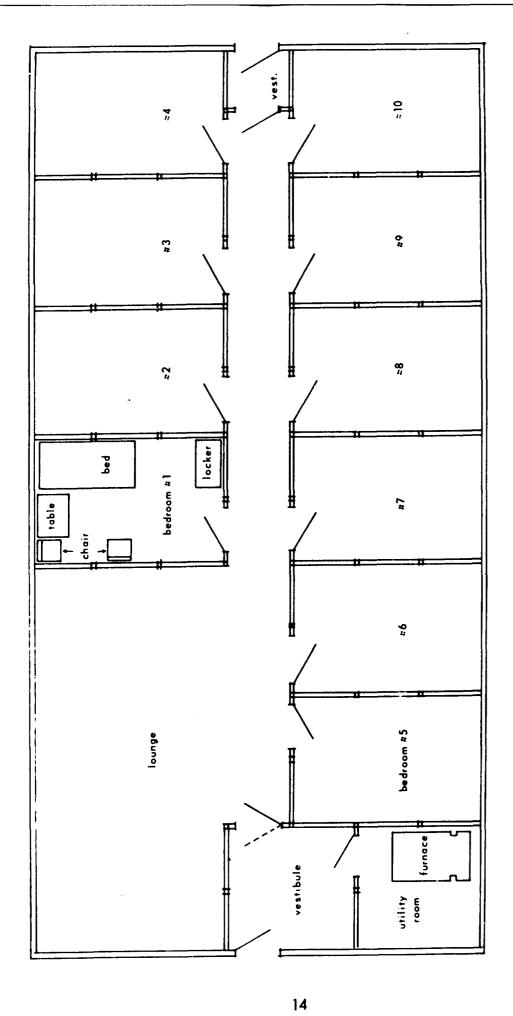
Floor plan of the prototype 10-bedroom quarters building.
